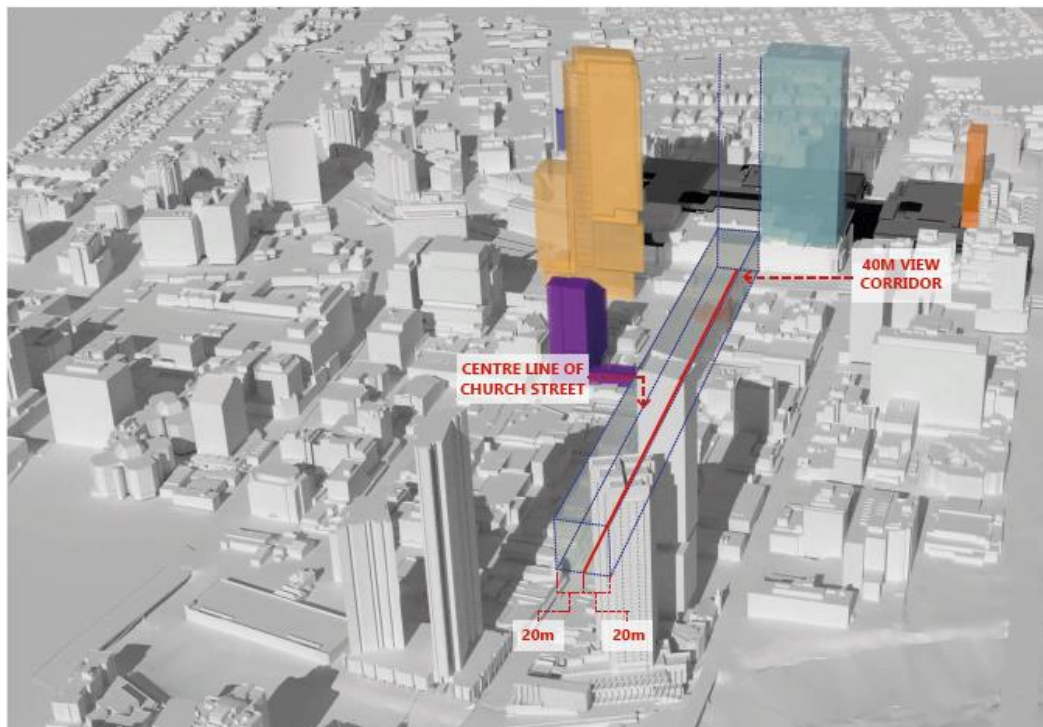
Proposed building envelope shown in pale blue outside of the 40 metres wide Church view corridor defined in the DCP. (Woods Bagot, 2020)
